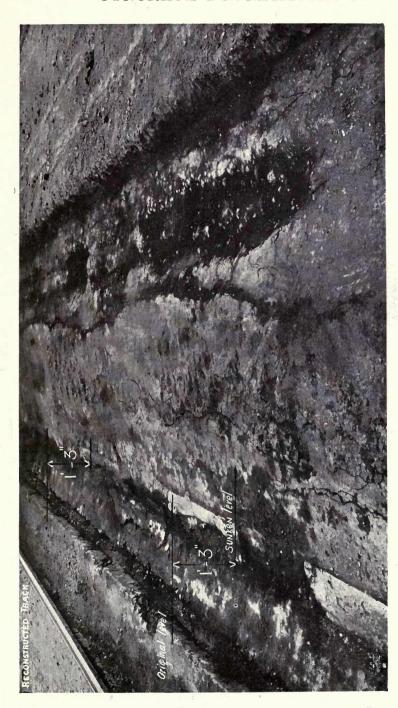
Showing Fractured and Sunk Concrete Foundations.
